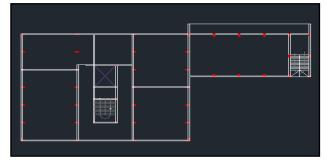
Plan of the multi storey building in AUTOCAD.
